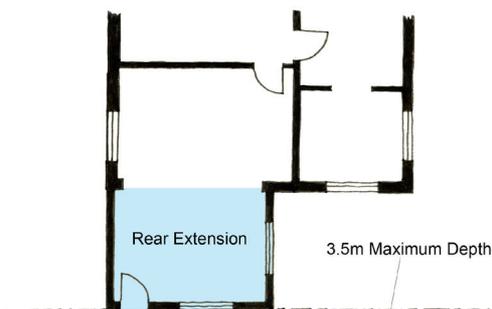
Single-storey rear extensions to detached houses should not exceed 3.5m in depth.
